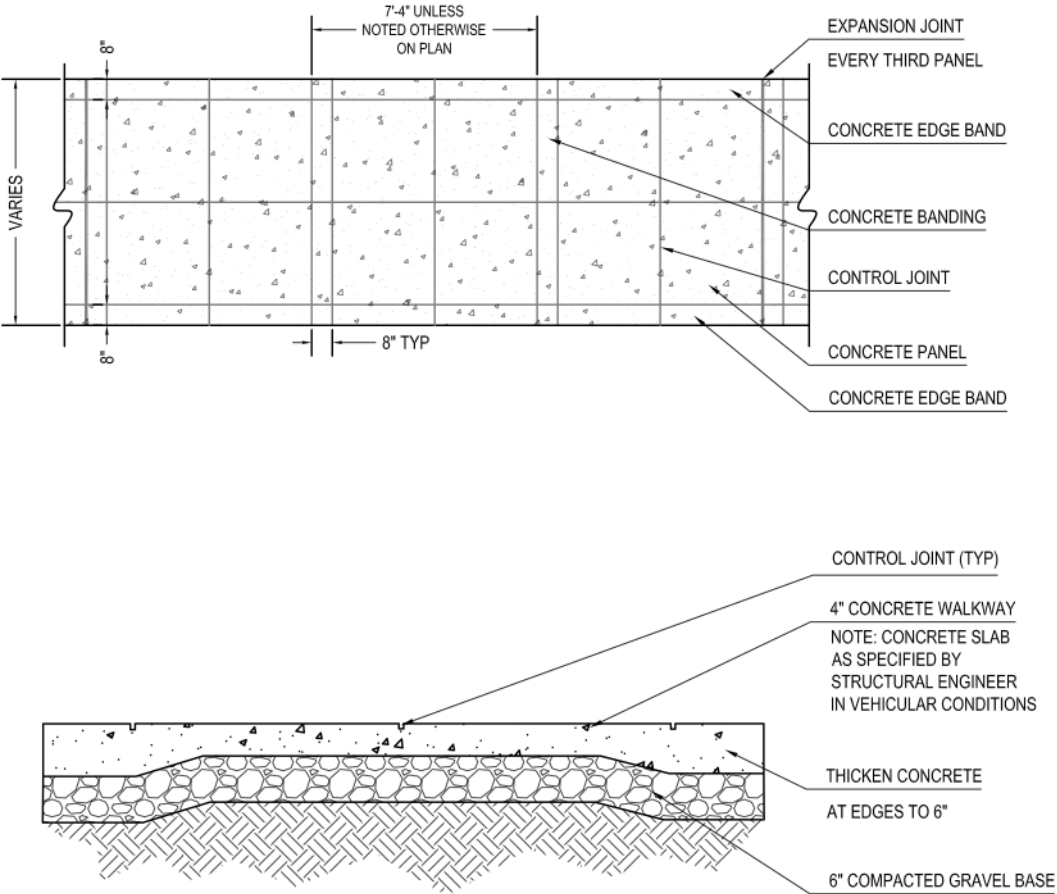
Plan and Section of Type D: Concrete Paving with Concrete Bands.
